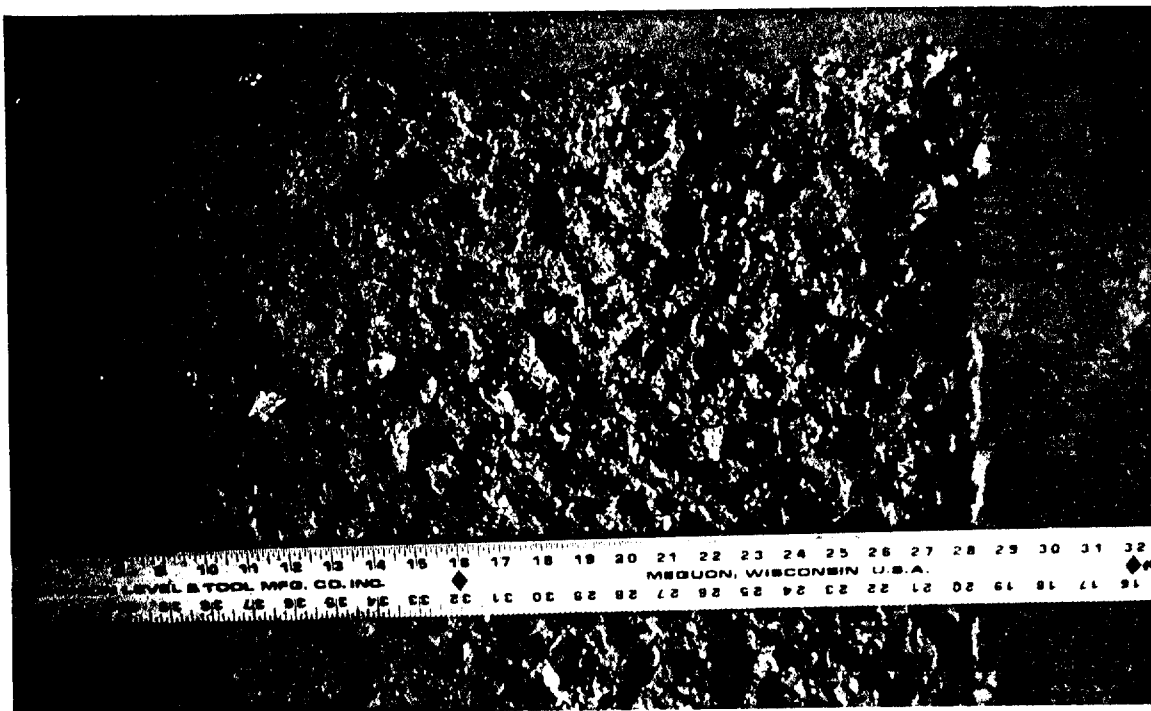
Appearance of EH Scabbled Concrete Surface. Oblique illumination used to increase contrast. Concrete floor at TSD site, scabbling depth 1/2".
